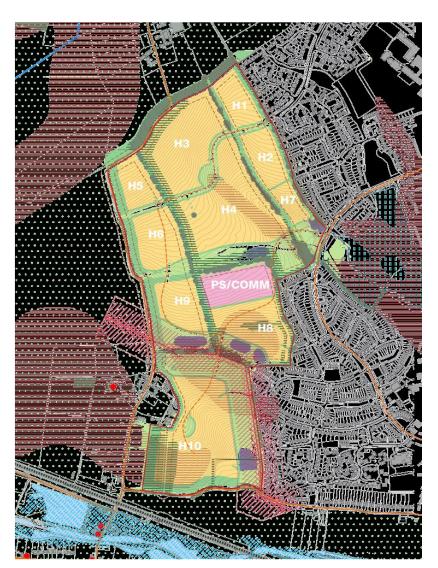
Site layout iteration 1 as shown in the DBC Local Allocation LA3 West Hemel Hempstead Draft Master Plan
